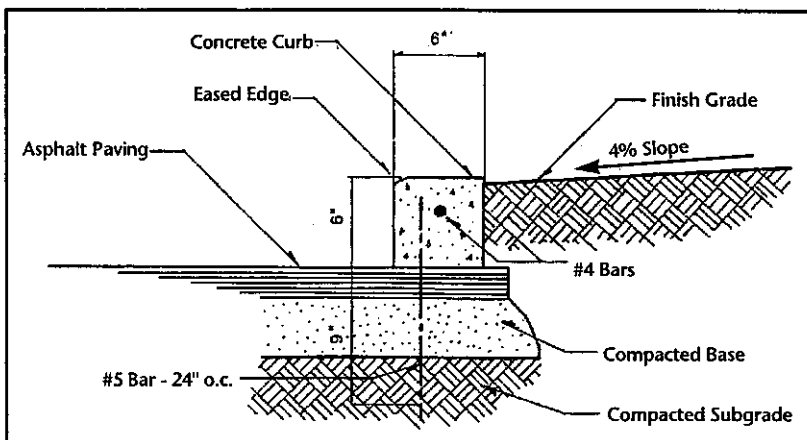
Placing the curb on top of the edge of pavement may reduce excavation into the root system compared to a typical curb detail. The curb is held in place with steel bars. (Adapted from detail provided by Howell Beach, Robert E. Marvin & Associates.)
